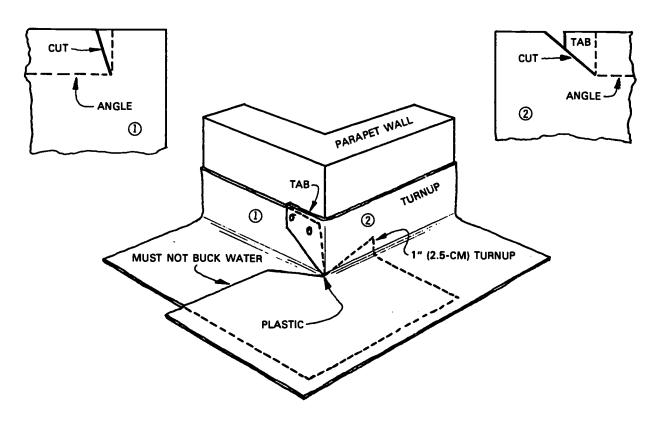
Alternate method of cutting an outside corner without a cant strip
